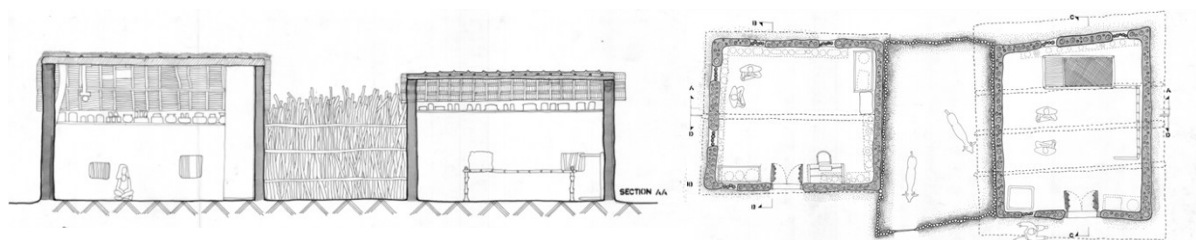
Cattle shade between two houses, Section (left) and Plan (right) (created by the Author)
